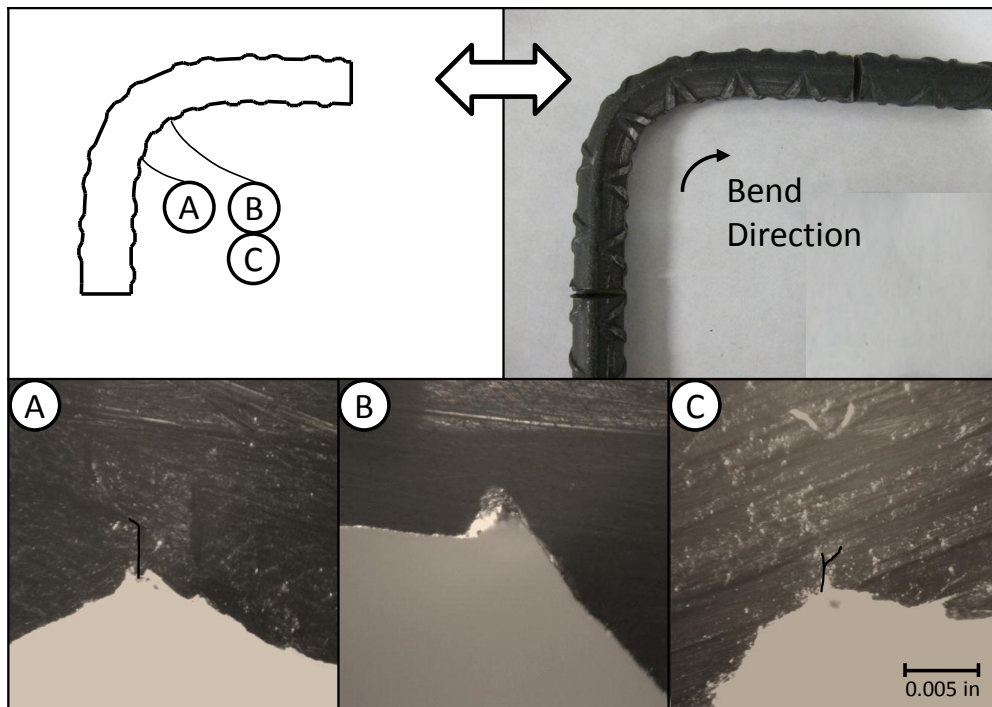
Cracks Identified on Specimen II-C-90-1.5-W
